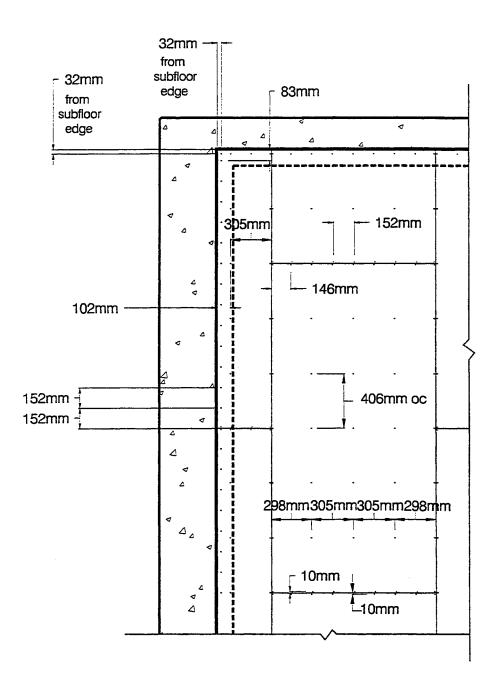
Screw pattern for face layer subfloor, joists 406 mm o.c.
